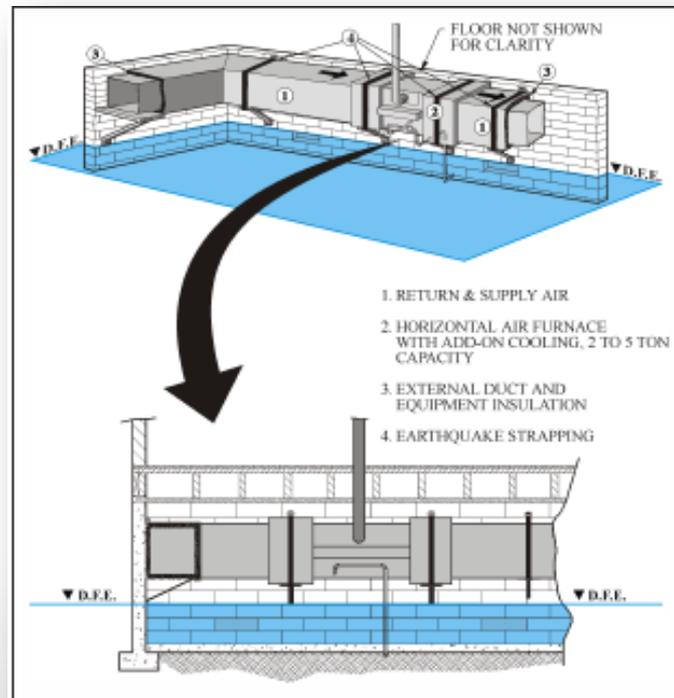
A: Elevation of HVAC components below a floor, but above the DFE
